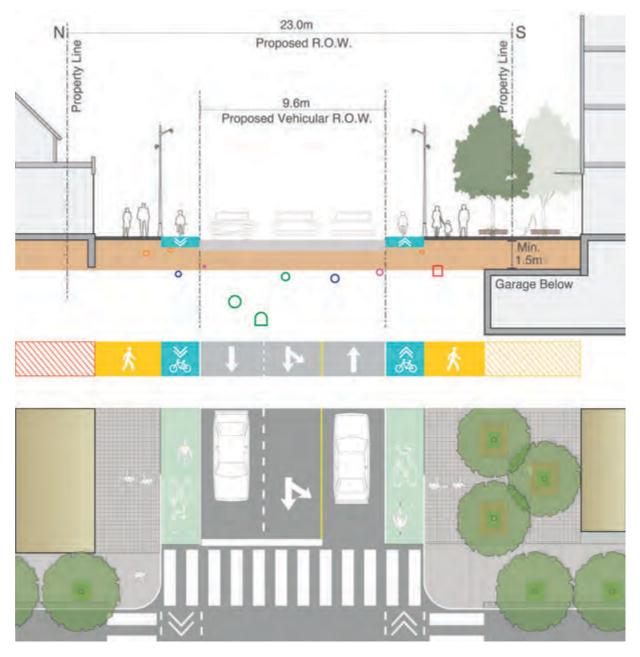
Section and Plan of Davisville Community Street - Recommended Final Condition at Yonge intersection
